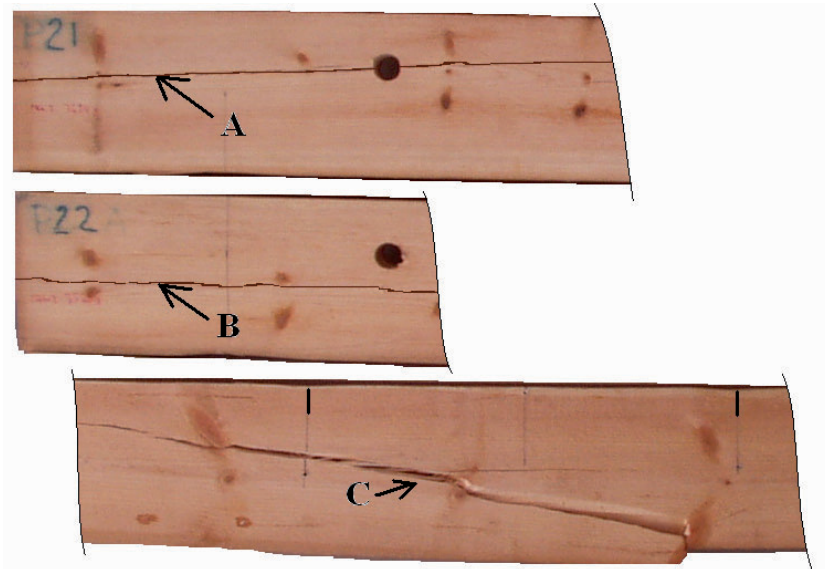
Examples of how the boards could crack through the reference hole (A), the pith (B) or knots (C).
